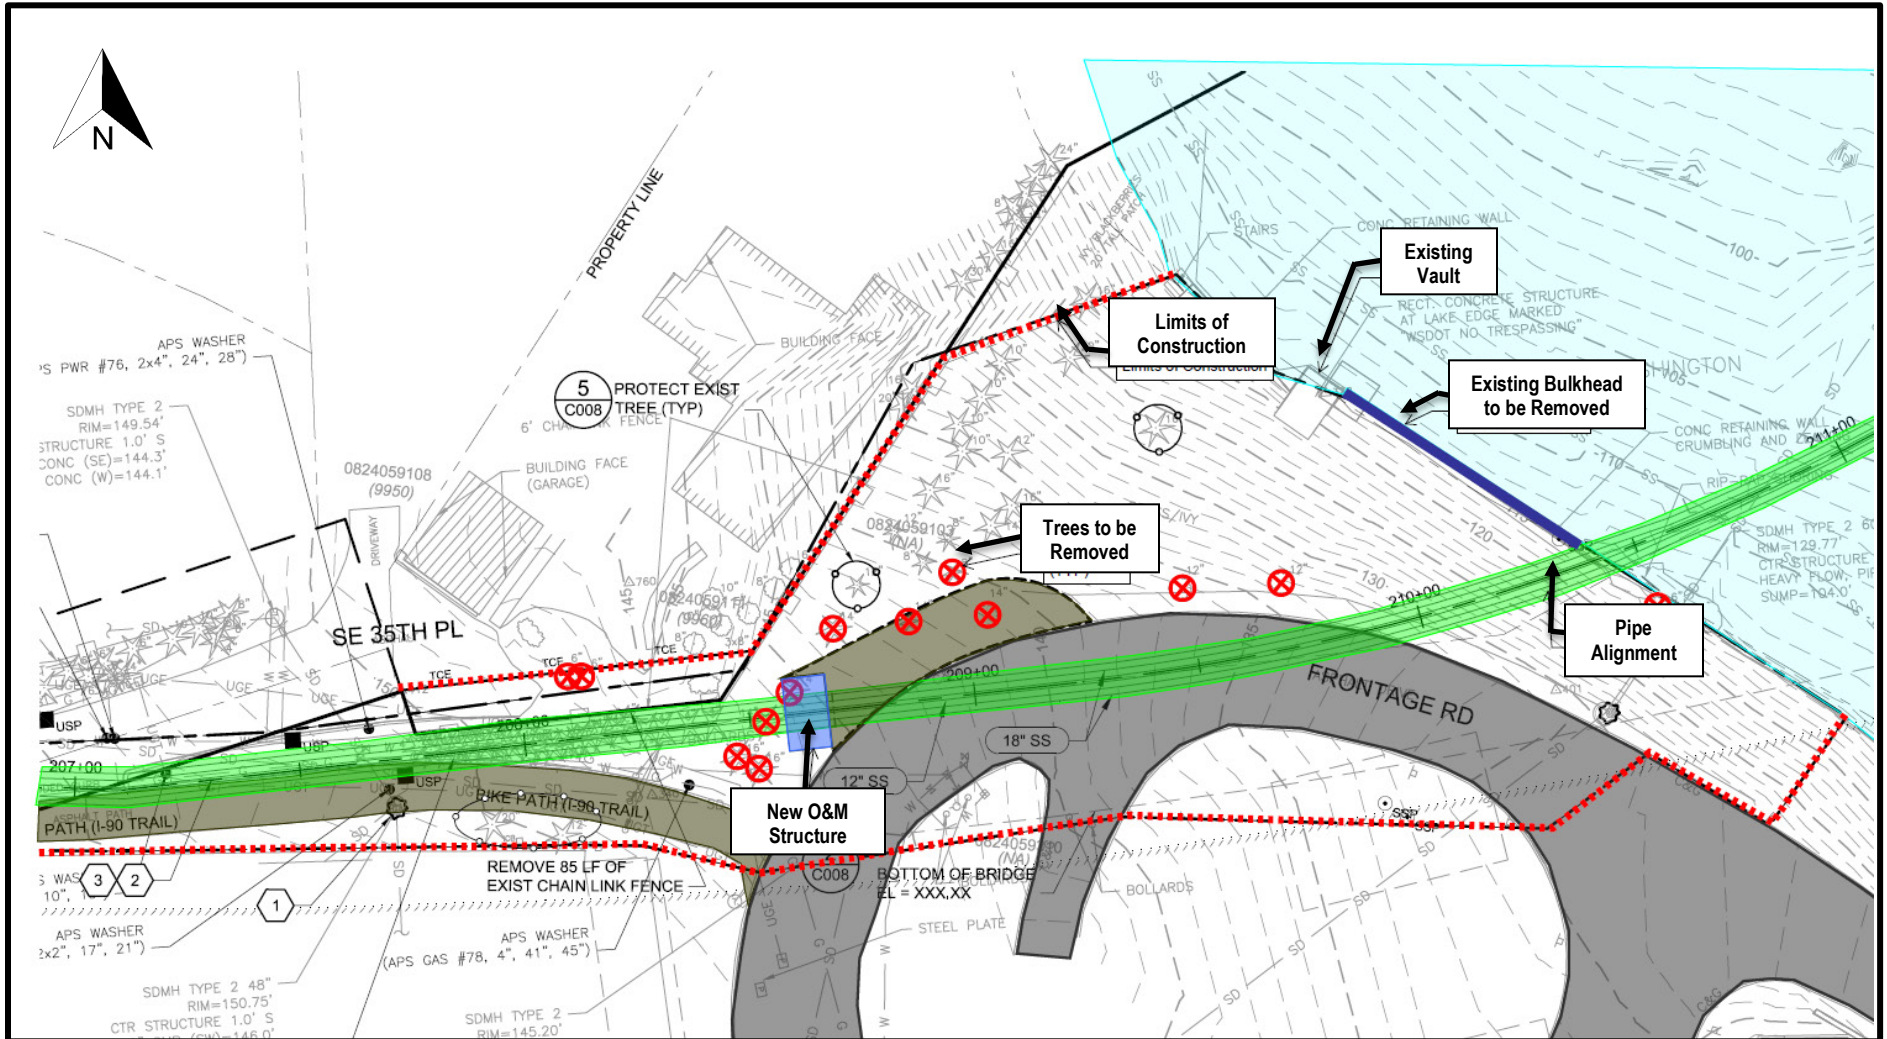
Proposed Construction Activities at the Mercer Island Boat Launch
